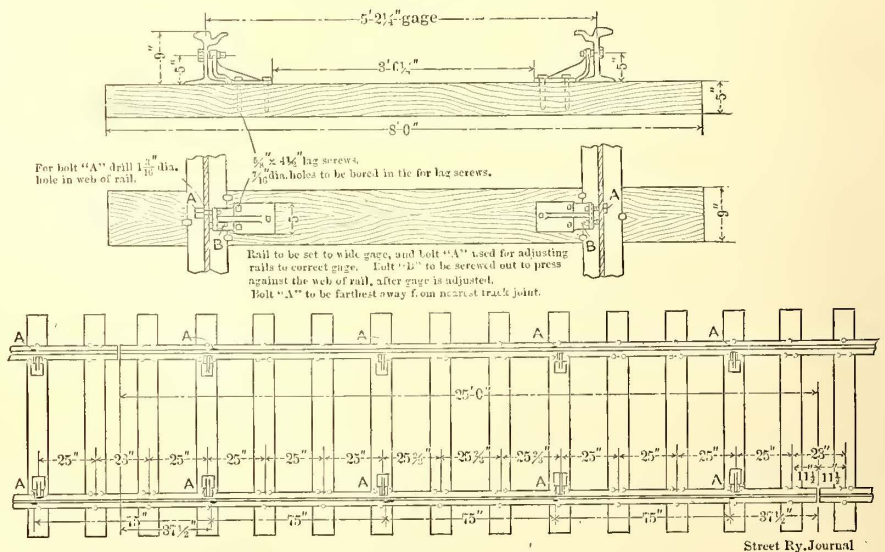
DRILLING AND TIE SPACING OF 50-FT. RAILS FOR RAIL BRACE CONSTRUCTION
